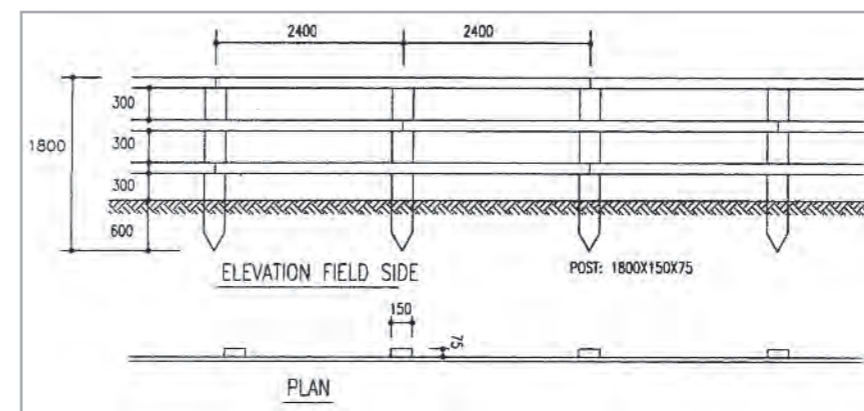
Post and rail stud fencing (measurements in mm)
